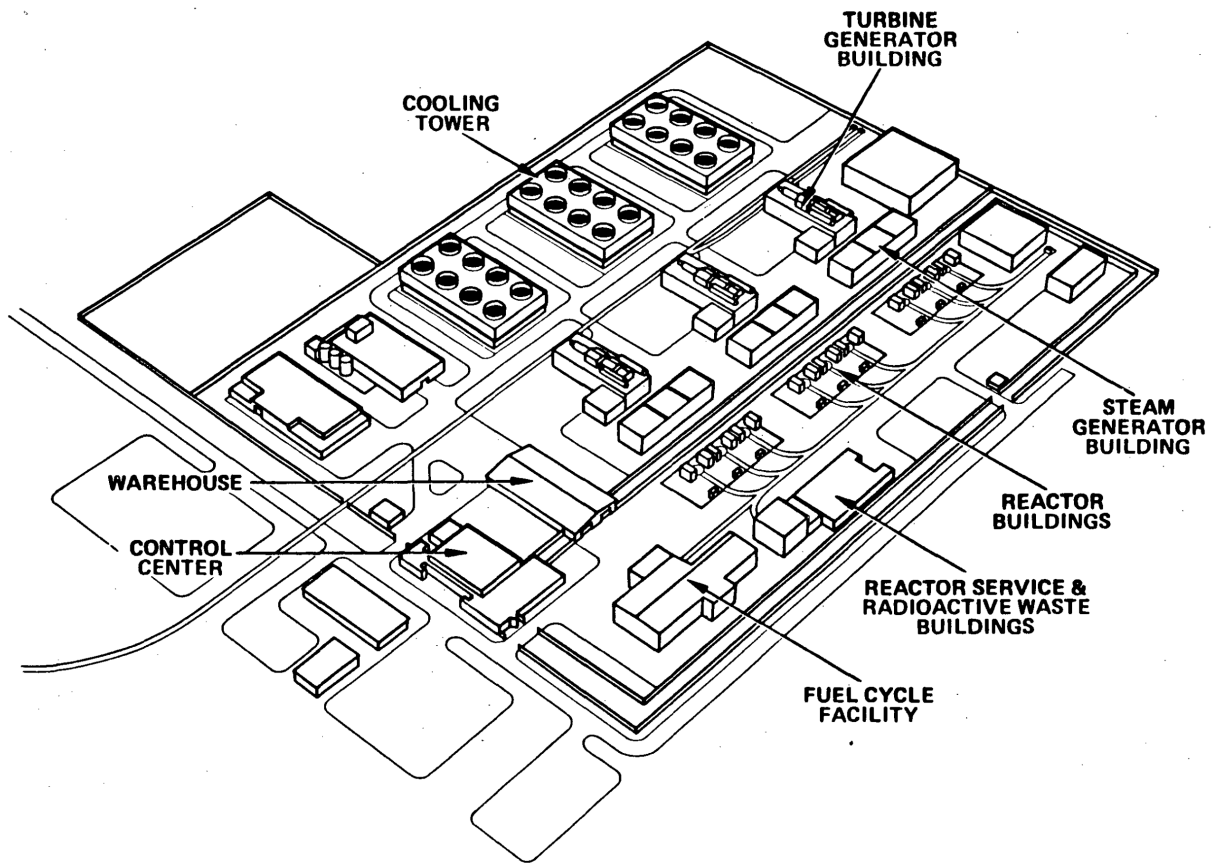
PRISM PLANT ARRANGEMENT
